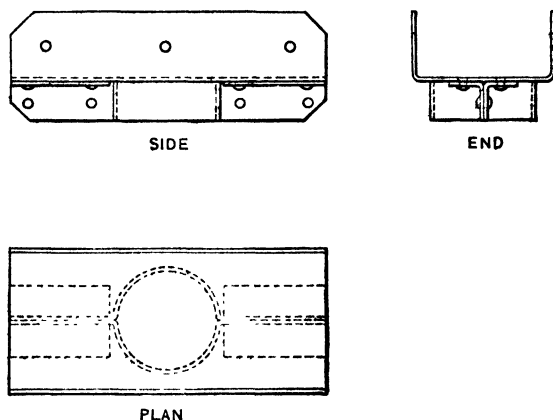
Steel Post-cap for Cylindrical Wooden Post. Elevations and Plan
